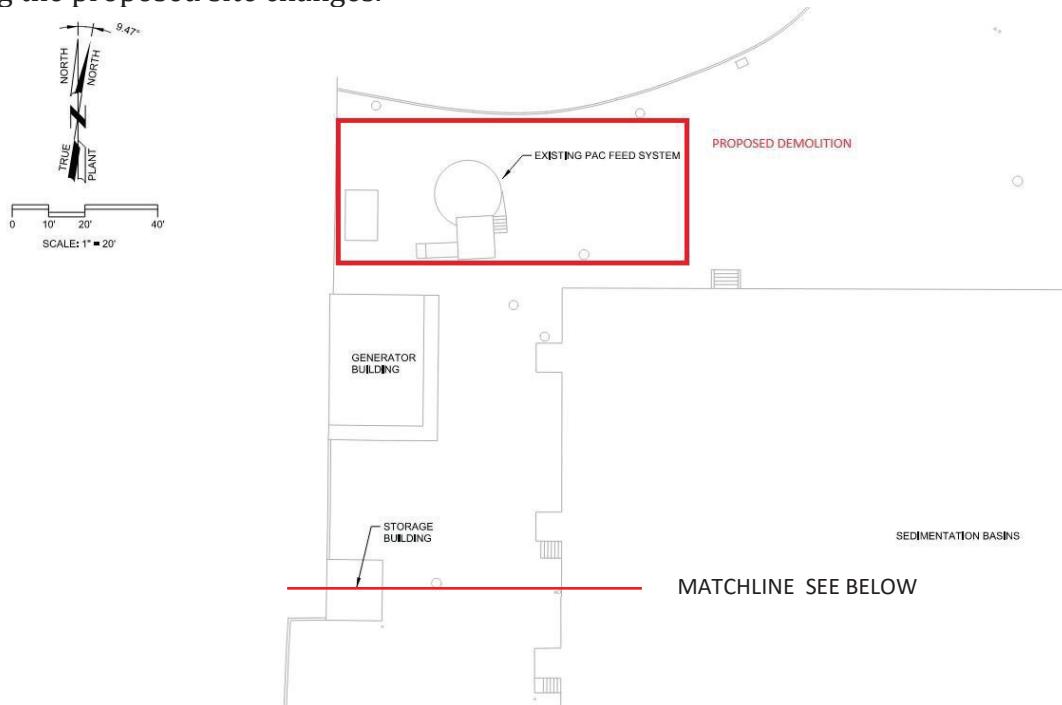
Figure A: Bountiful Weber Basin Water Conservancy District at 38 N Davis Blvd., Proposed Site Plan 2024
